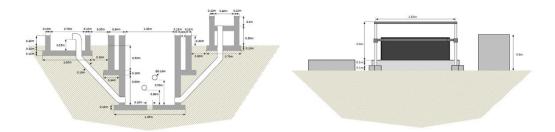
Technical drawing of a floating drum biodigester used in this experiment
